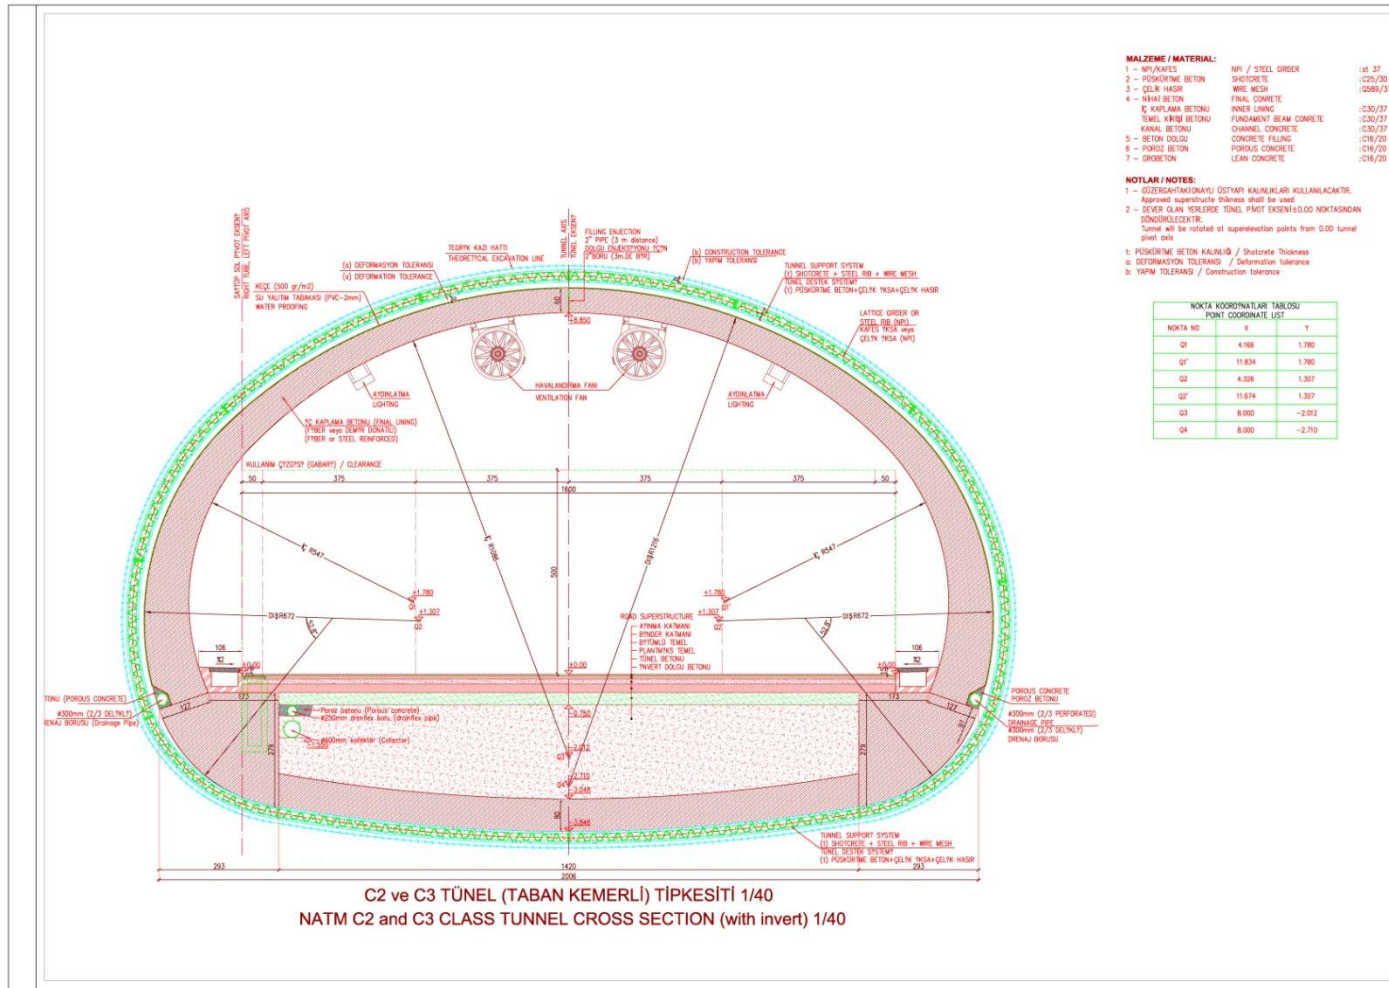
Typical Cross-section for the Tunnels (3/3)
